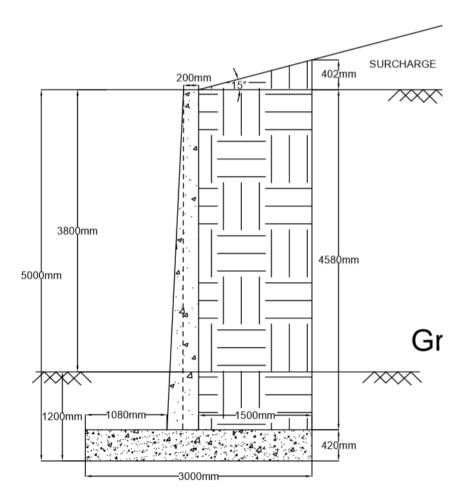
Final calculated dimension of cantilever retaining wall.
